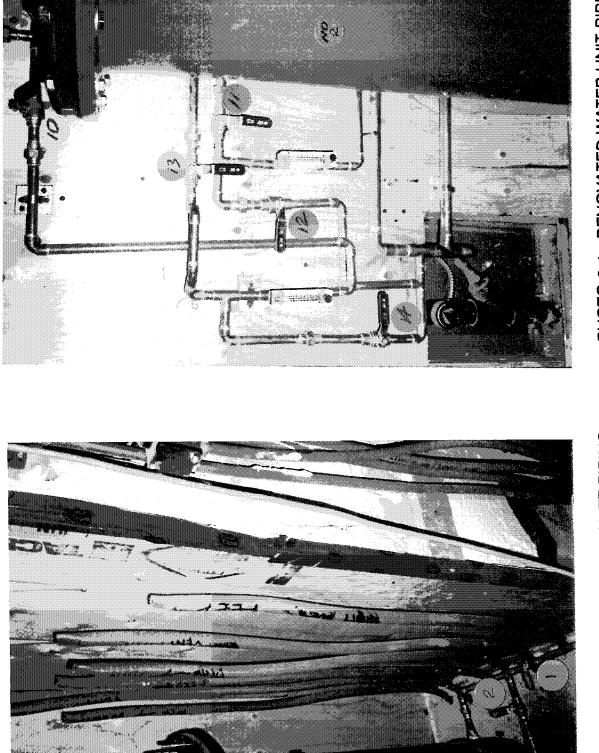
RENOVATED WATER UNIT PIPING
